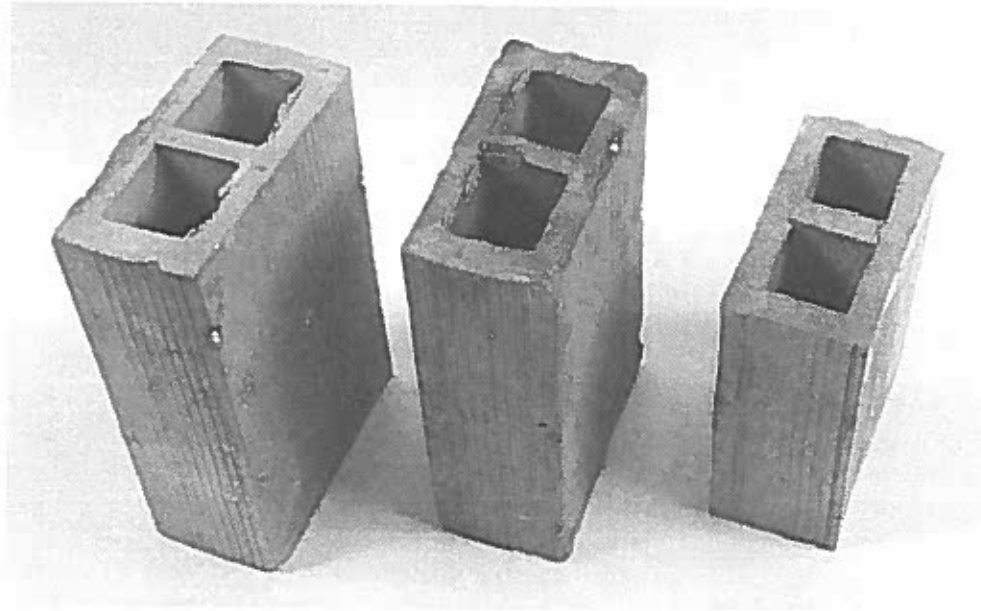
Large and Medium Sizes of Hollow Building Blocks (Specimens I-6, I-7, and I-8).
